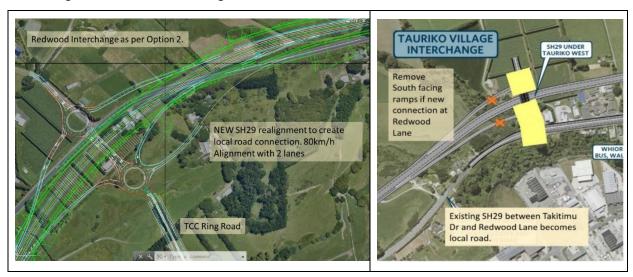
Redwood/Tauriko West Interchange - Local Road Connection Option
